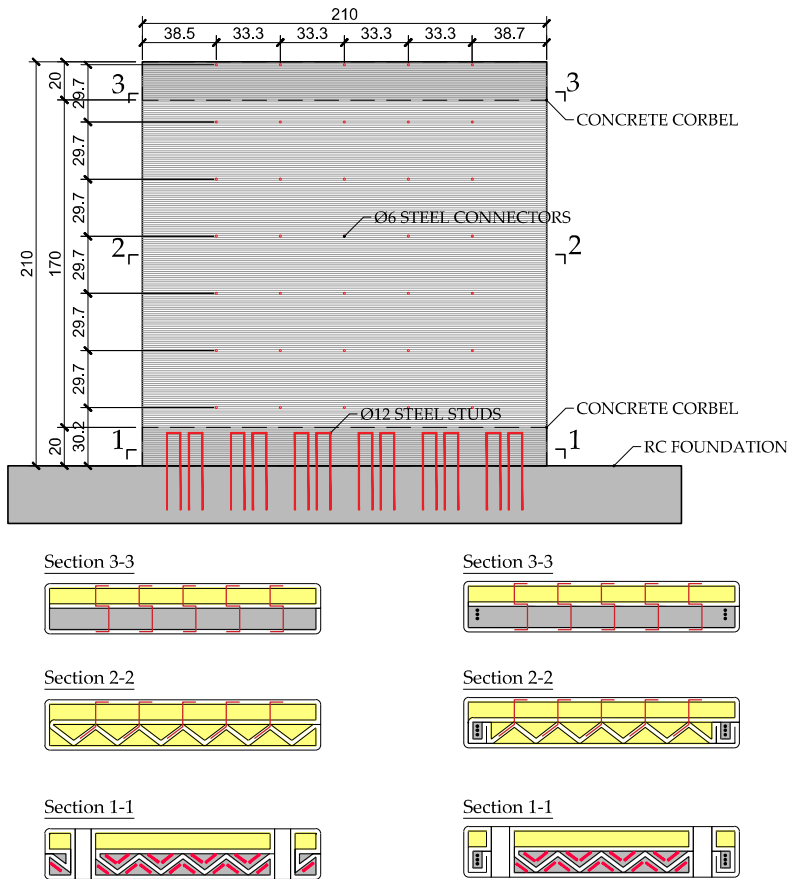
Side view and cross-section view of the 3D printed concrete walls.
